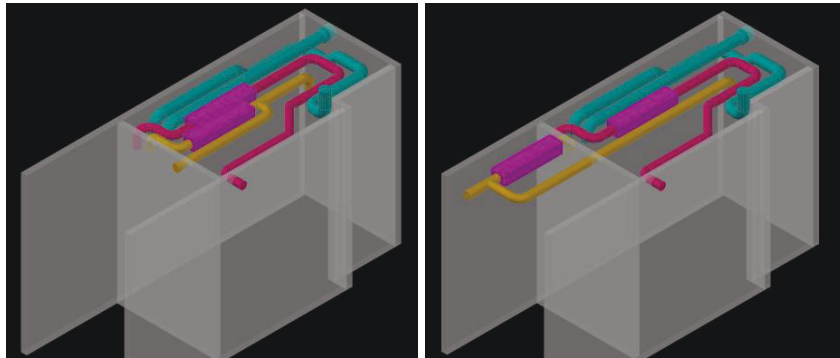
Ventilation ducts in suspended ceiling of bathroom and adjacent hall. Designers solution 6a on the left and installers solution 6b on the right.
